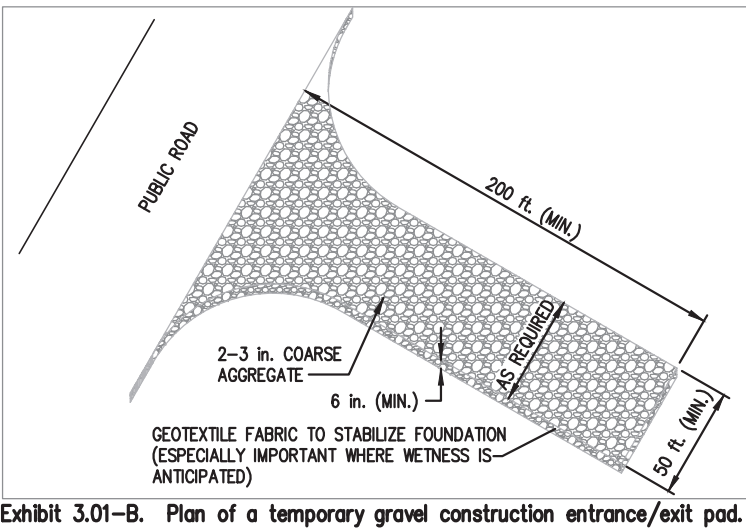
B. Plan of a temporary gravel construction entrance/exit pad.
